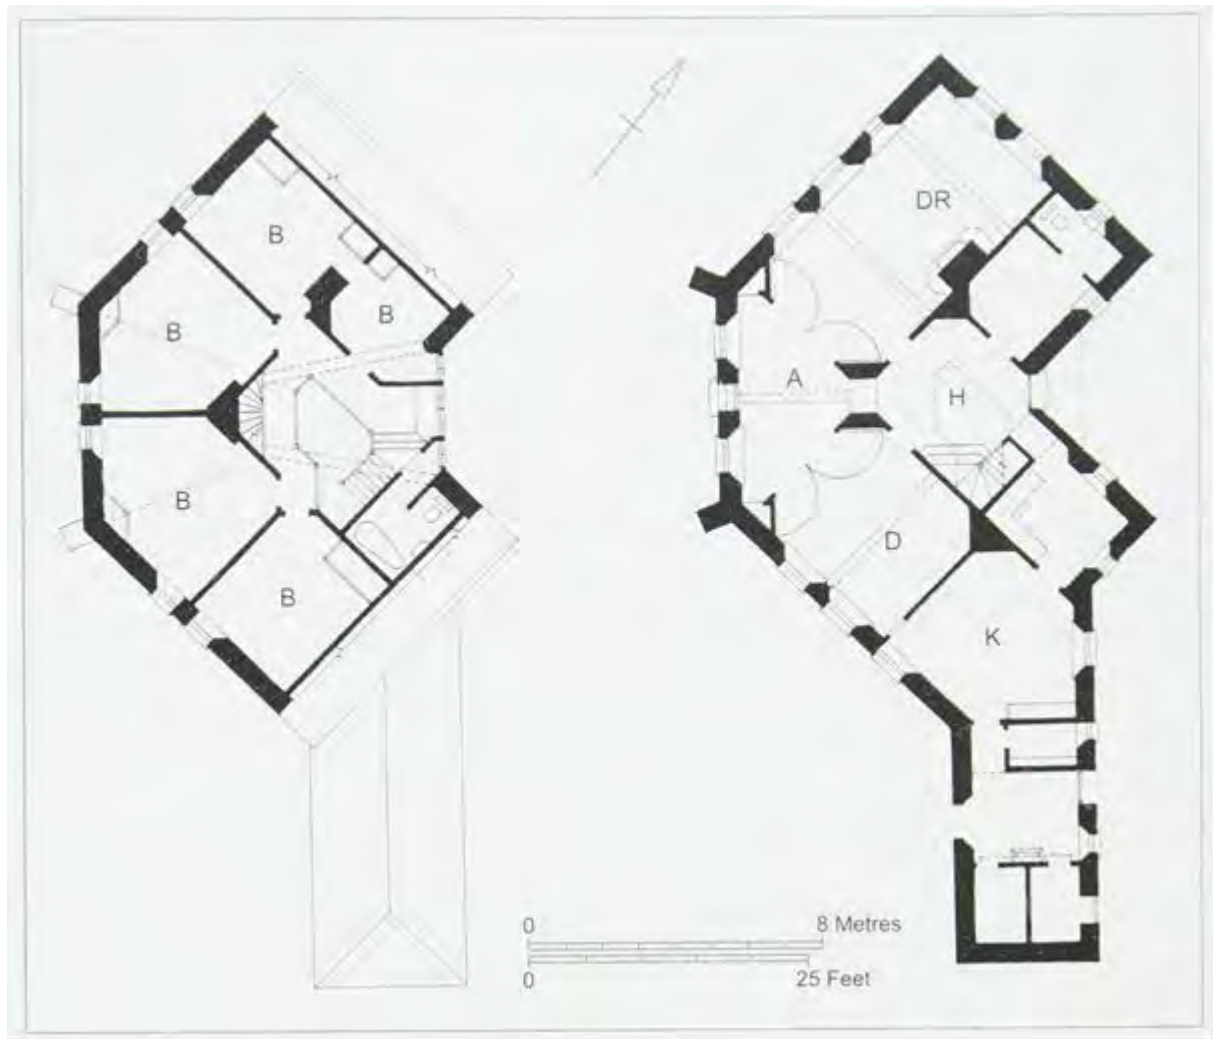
Floor plan of Wern Isaf LB3567 (after Voelcker, 2011, 21)
